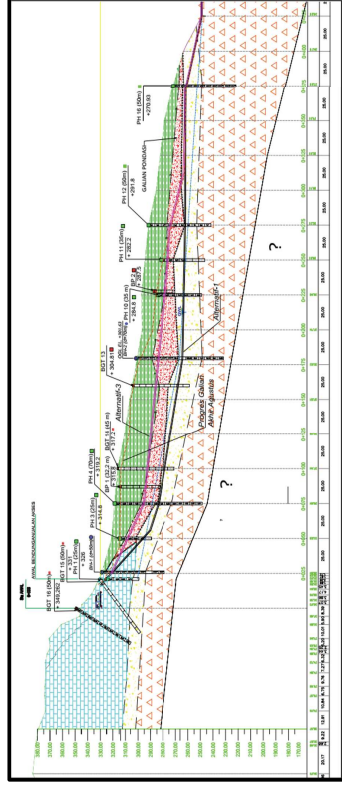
Longitudinal Geological Cross Section of the Left Abutment of Bagong Dam
